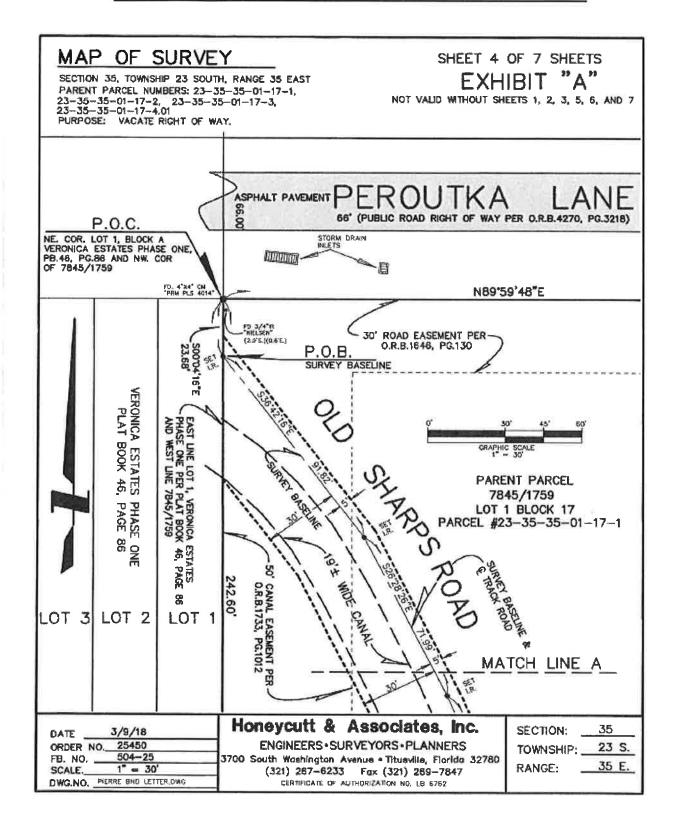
Copy of sketch sheet 4 of 7 of right-of-way Old Sharpes Road.
